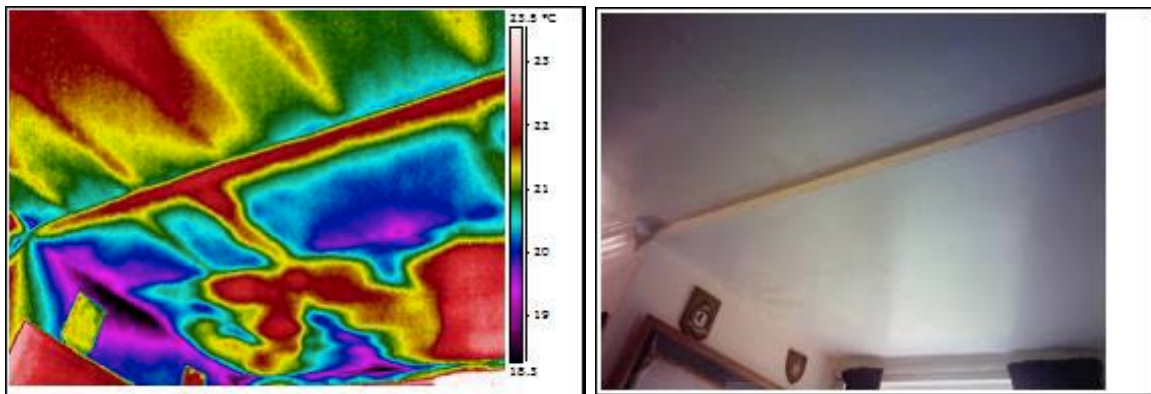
Room G25. The image shows thermal anomalies on the ceiling of meeting room at ground floor. It is likely to be due to poor insulation of pitched roof above windows.
